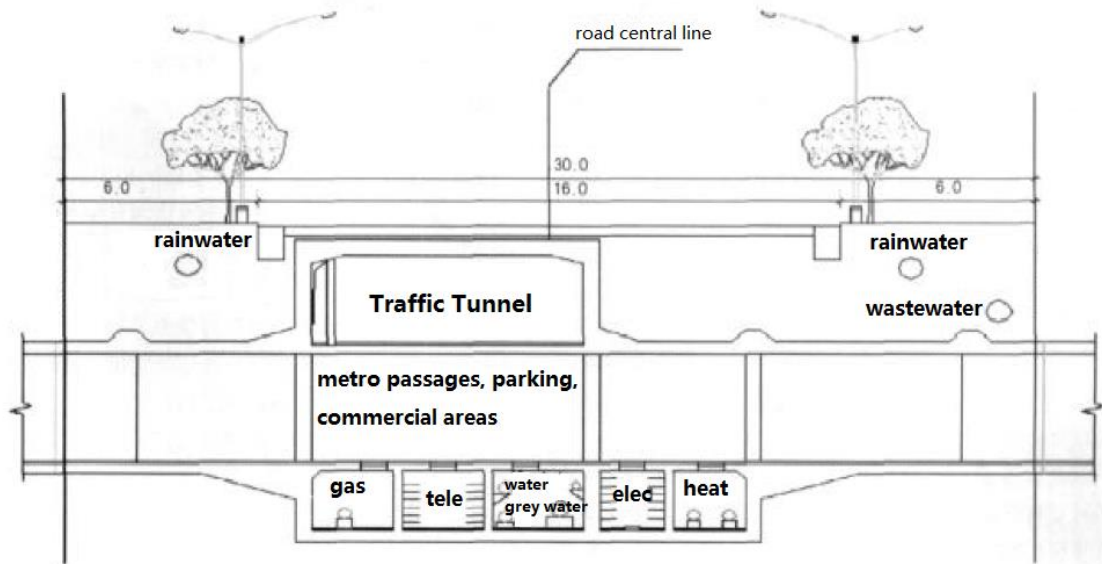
Cross-section of underground layout including Zhongguancun MUT (Su, 2007)
